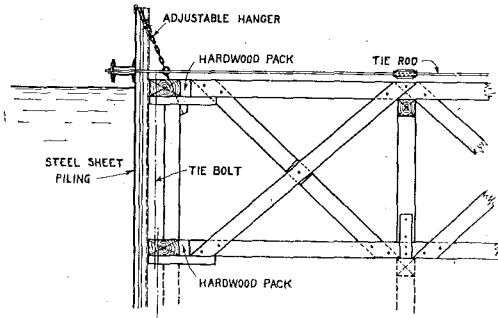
FRAMED BRACING SET IN PLACE BEFORE THE DAM IS DE-WATERED.
